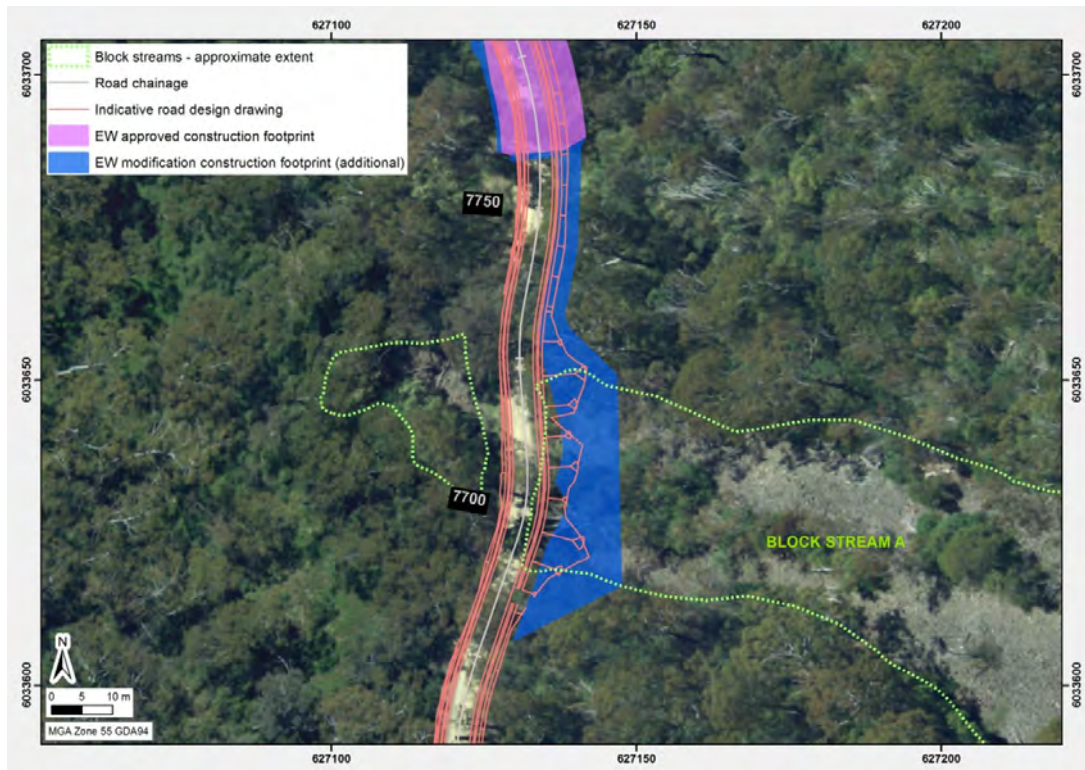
Aerial view of Block Stream A, at Lobs Hole Ravine Road, showing the extent of the proposed additional construction footprint and the indicative road design drawing for this section.
